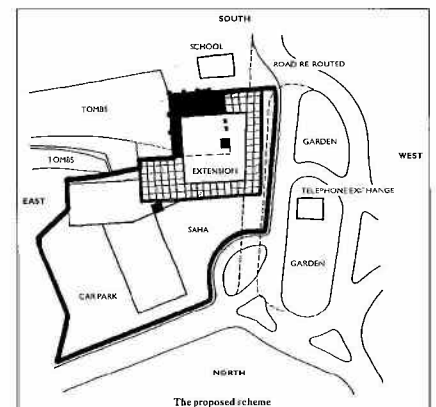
Plan of mosque site showing burial ground, school and Qibla wall
